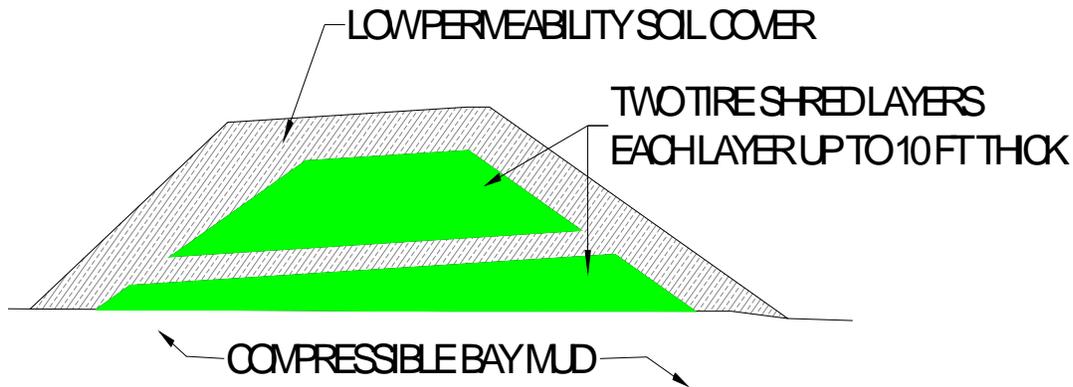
Typical cross section, Dixon Landing Interchange.
